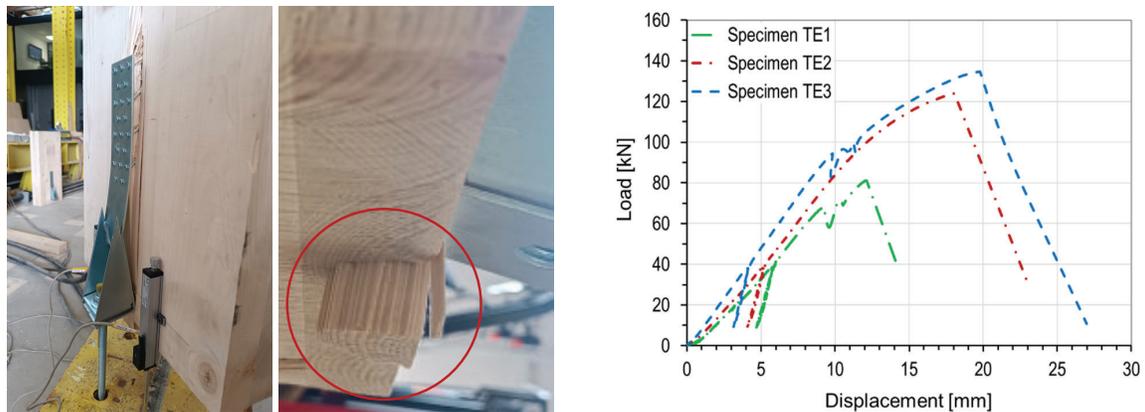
Typical failure of the test specimen with a tension anchor (the circled area in the photo highlights the block shear failure, left and middle), displacement in the connection vs. load of the test specimen (entire specimen with two anchors, right).
